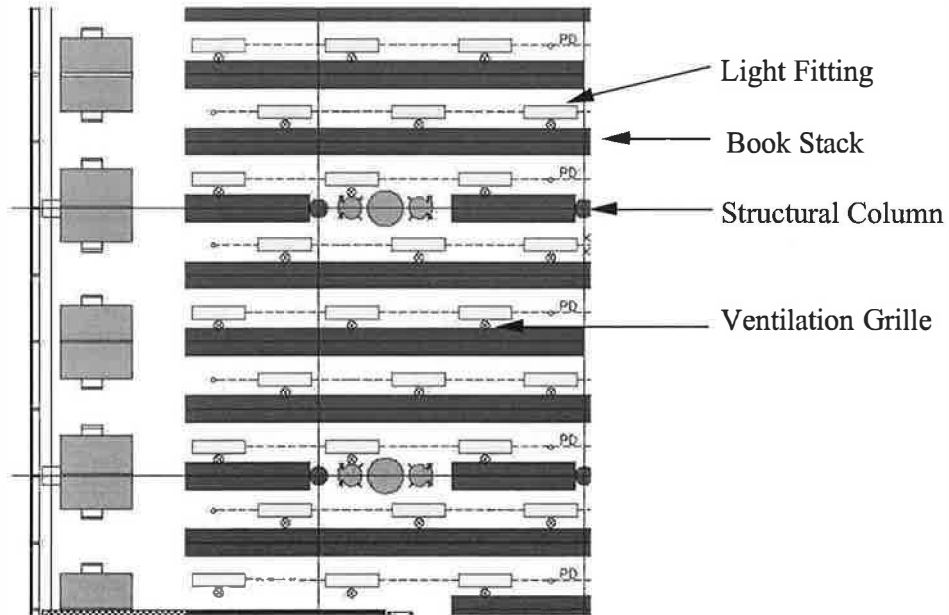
Typical Array of Stacks, Lights & Extract Grilles.
